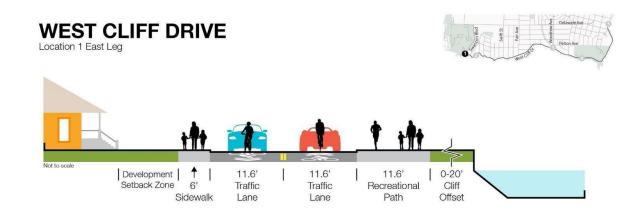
Cross Section of West Cliff Drive Proposed Alternative 1 Enhancements at Swanton Blvd
